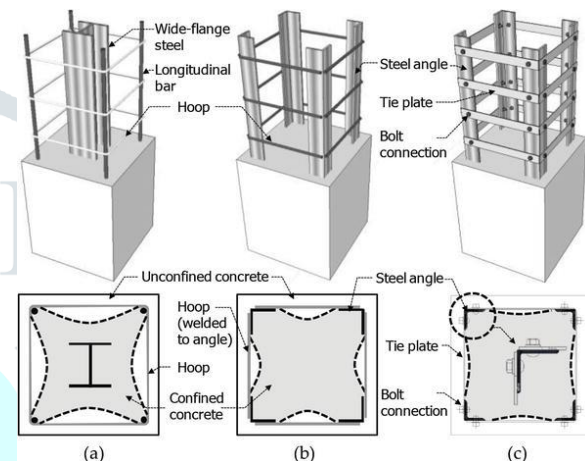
Column Composite Section (A) I Girder (B) Angle at Corners (C) Angle at Center
